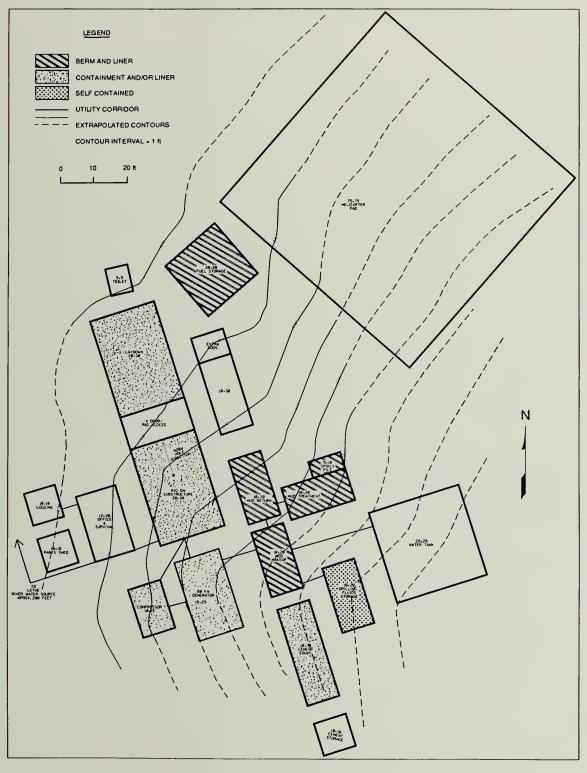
Proposed Layout of the Dome Drill Site and Supporting Camp
